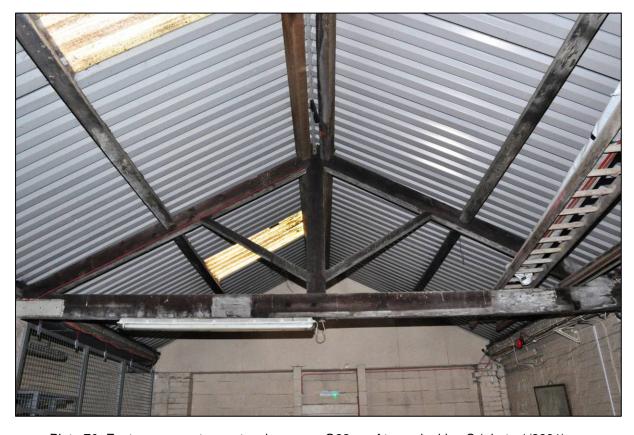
East range, eastern extension, room G22, roof truss, looking S (photo 1/2891).
